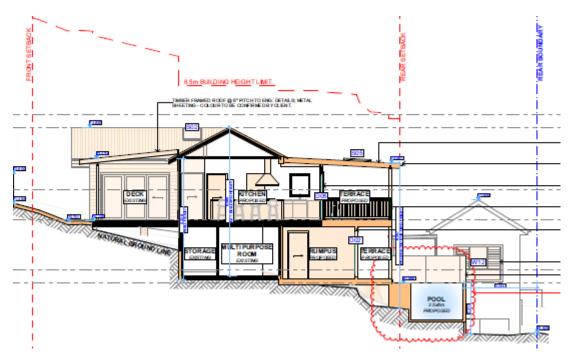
Extract from Proposed Cross Sections - Long Section 2 (MOD10) – area to be modified shown in red bubble
